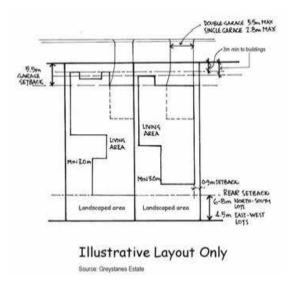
Type A Detached Dwelling- Pemulwuy South- setbacks layout
